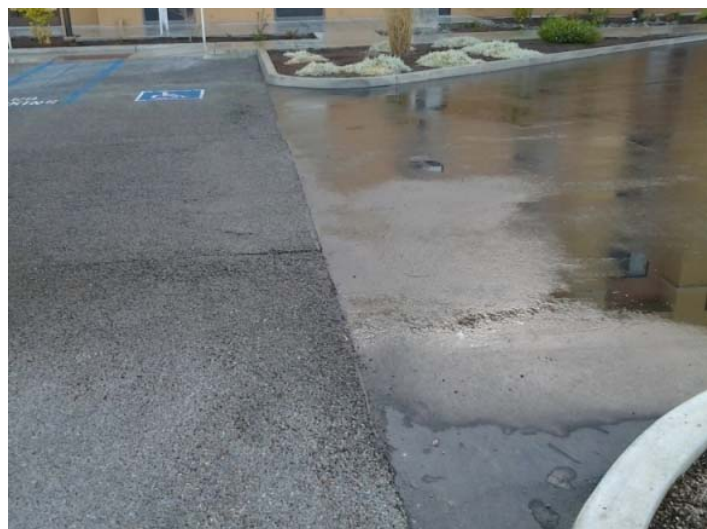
Pervious pavement (left side) and traditional impervious pavement (right side). Areas of pooled water are seen on the impervious surface.
